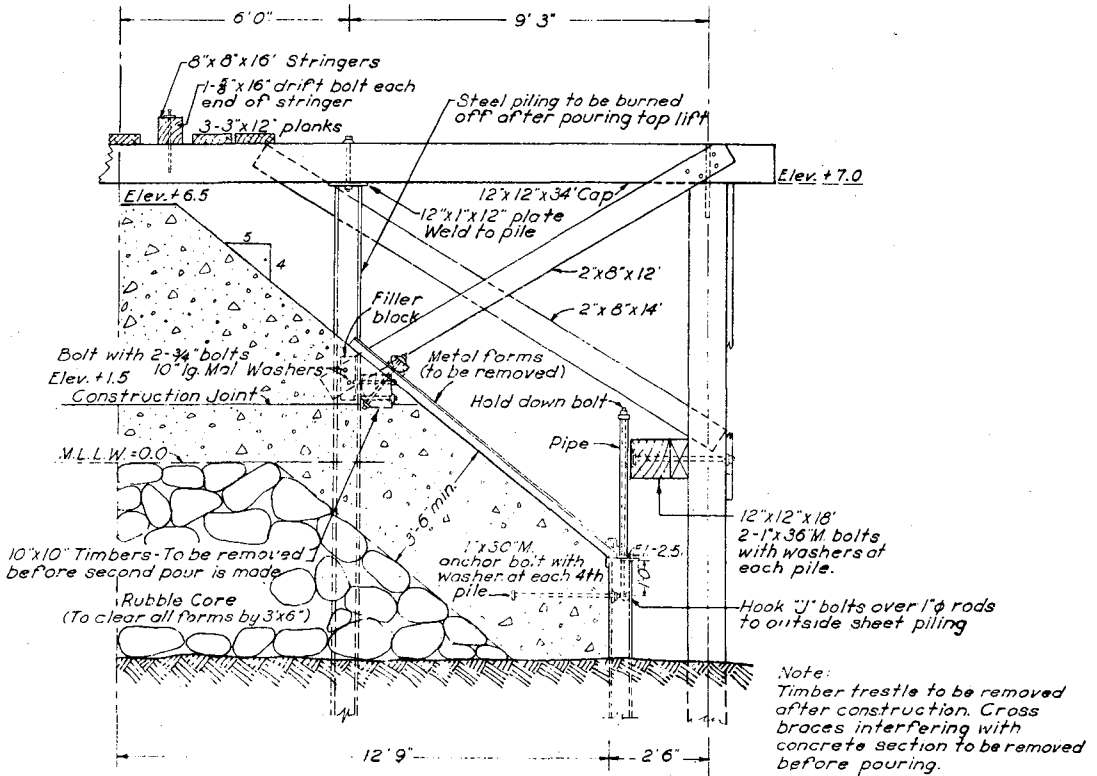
Typical Section, Nome Harbor, Alaska -- West Jetty
